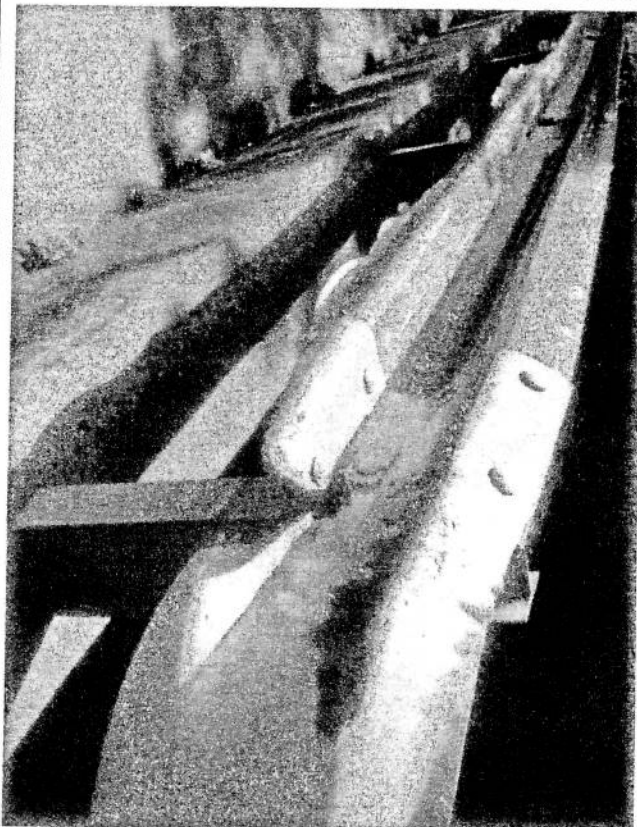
NORTHWEST BRIDGE RAIL WITH A TORN END SECTION CREATING A POTENTIAL SNAGGING HAZARD.
